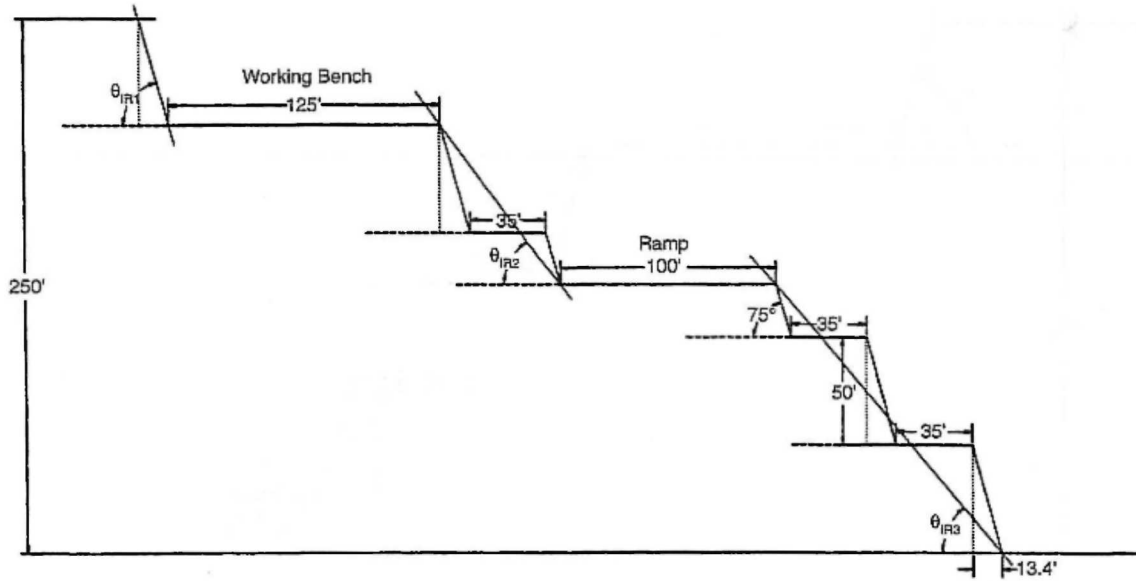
Interramp slope angles for a slope containing a working bench and a ramp.
